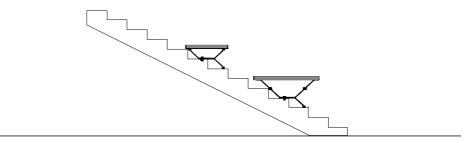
'Medium;. Section of stairs and sitting elements. Image by author.
